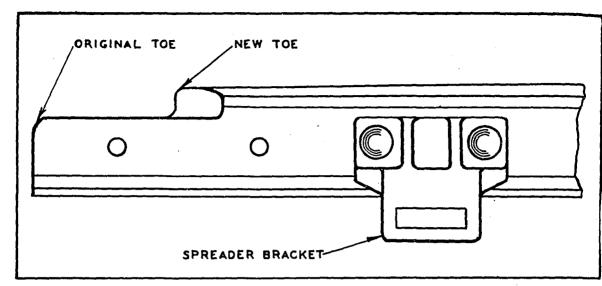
REMACHINING A CRUSHED SWITCH TO GIVE A NEW TOE
